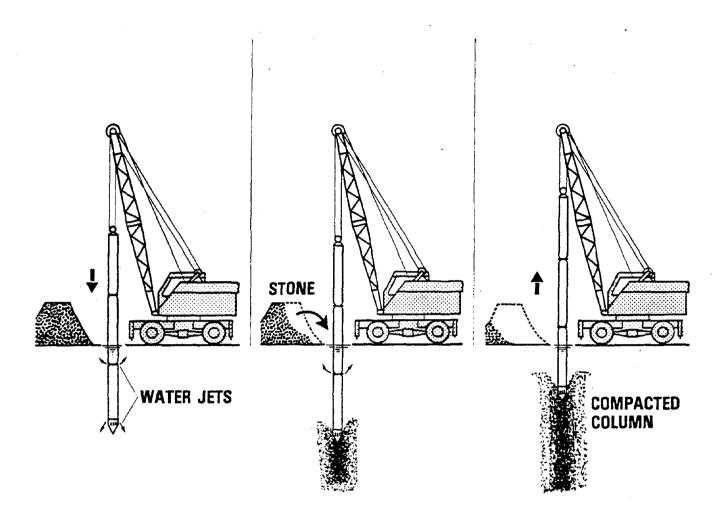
Stone columns constructed by vibroreplacement (DiMaggio, 1978)
